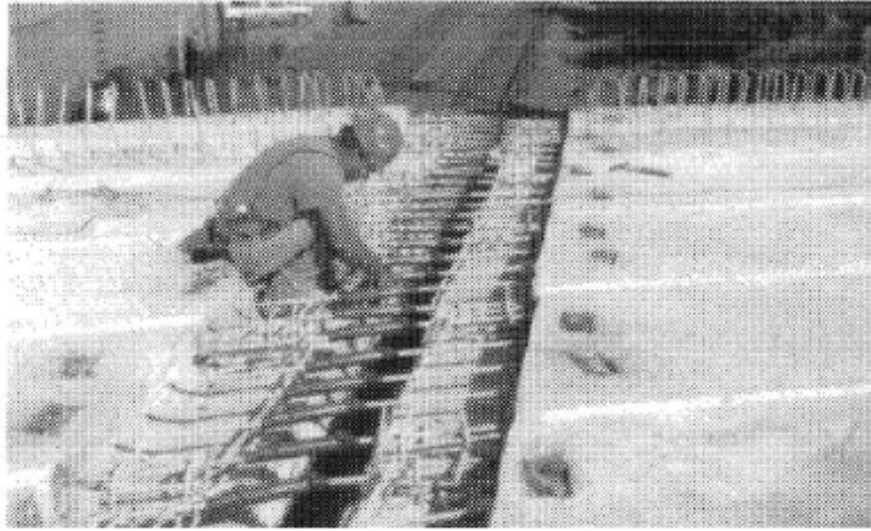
Grout filled splices used in continuity connections (Jansson, 2008)
